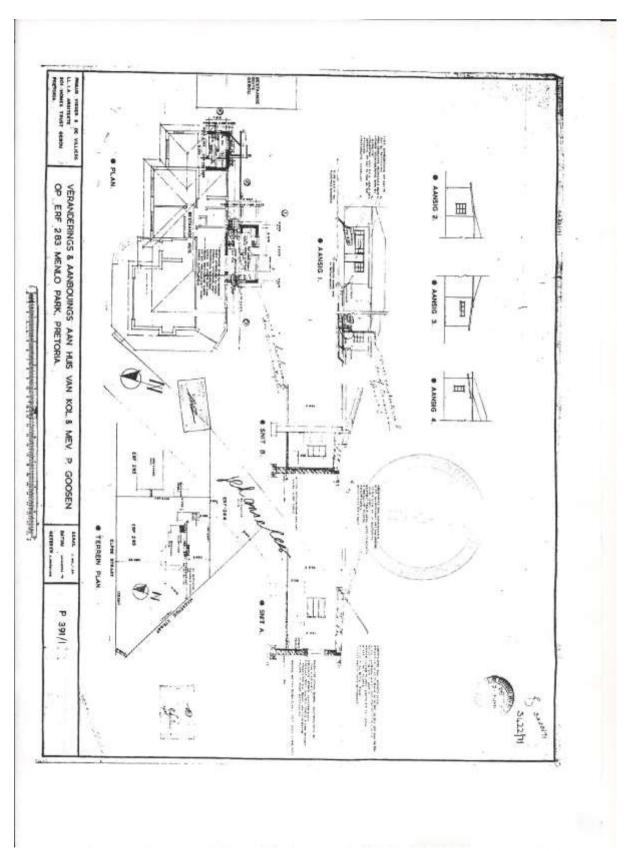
Building plans for proposed changes and additions to the house of Colonel & Mrs. P. Goosen on Erf 283.
